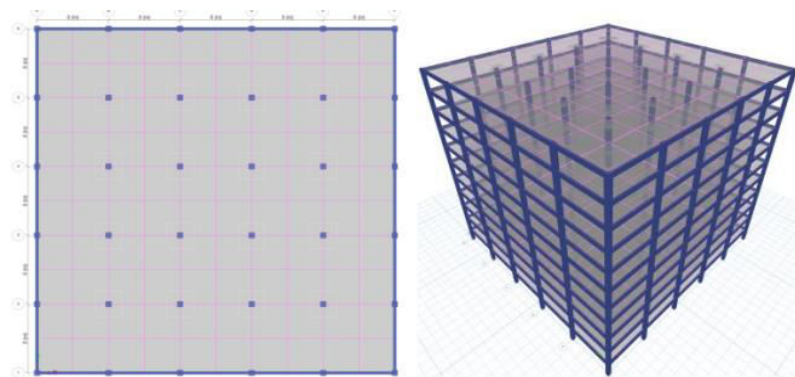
Building having Flat Slab with Drop Panels and Perimeter Beam [8]
